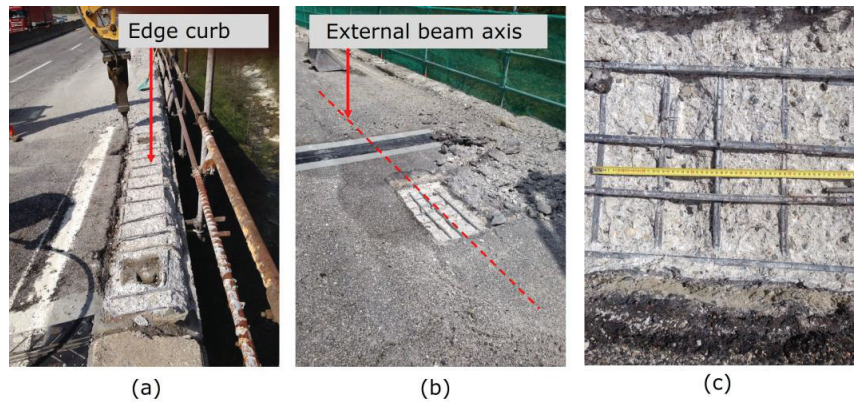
Example of in situ investigations for (a) edge curb detailing, (b) slab reinforcement across the external beam, and (c) detailed survey of reinforcement reported in (b).
